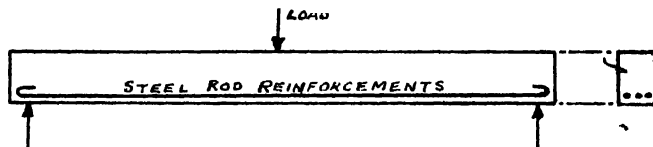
SIMPLE REINFORCED CONCRETE BEAM SHOWING STEEL RODS USED TO RESIST TENSION
